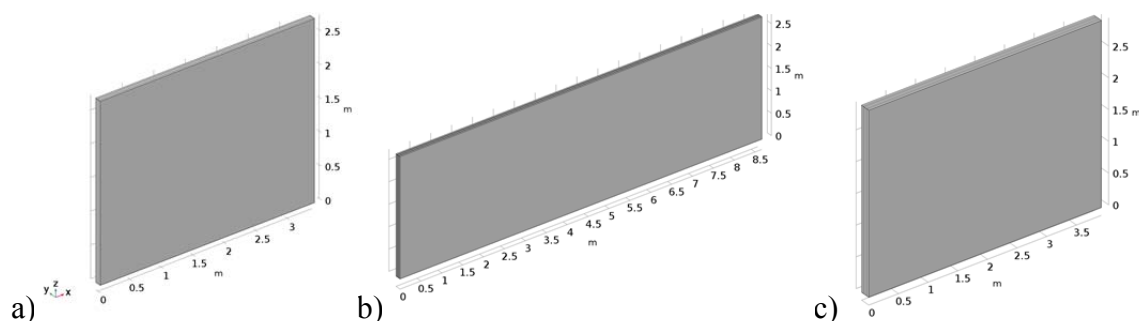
Numerical models of the single panels of cross-laminated timber – a) 3s wall; b) 5s wall; c) 5s floor
